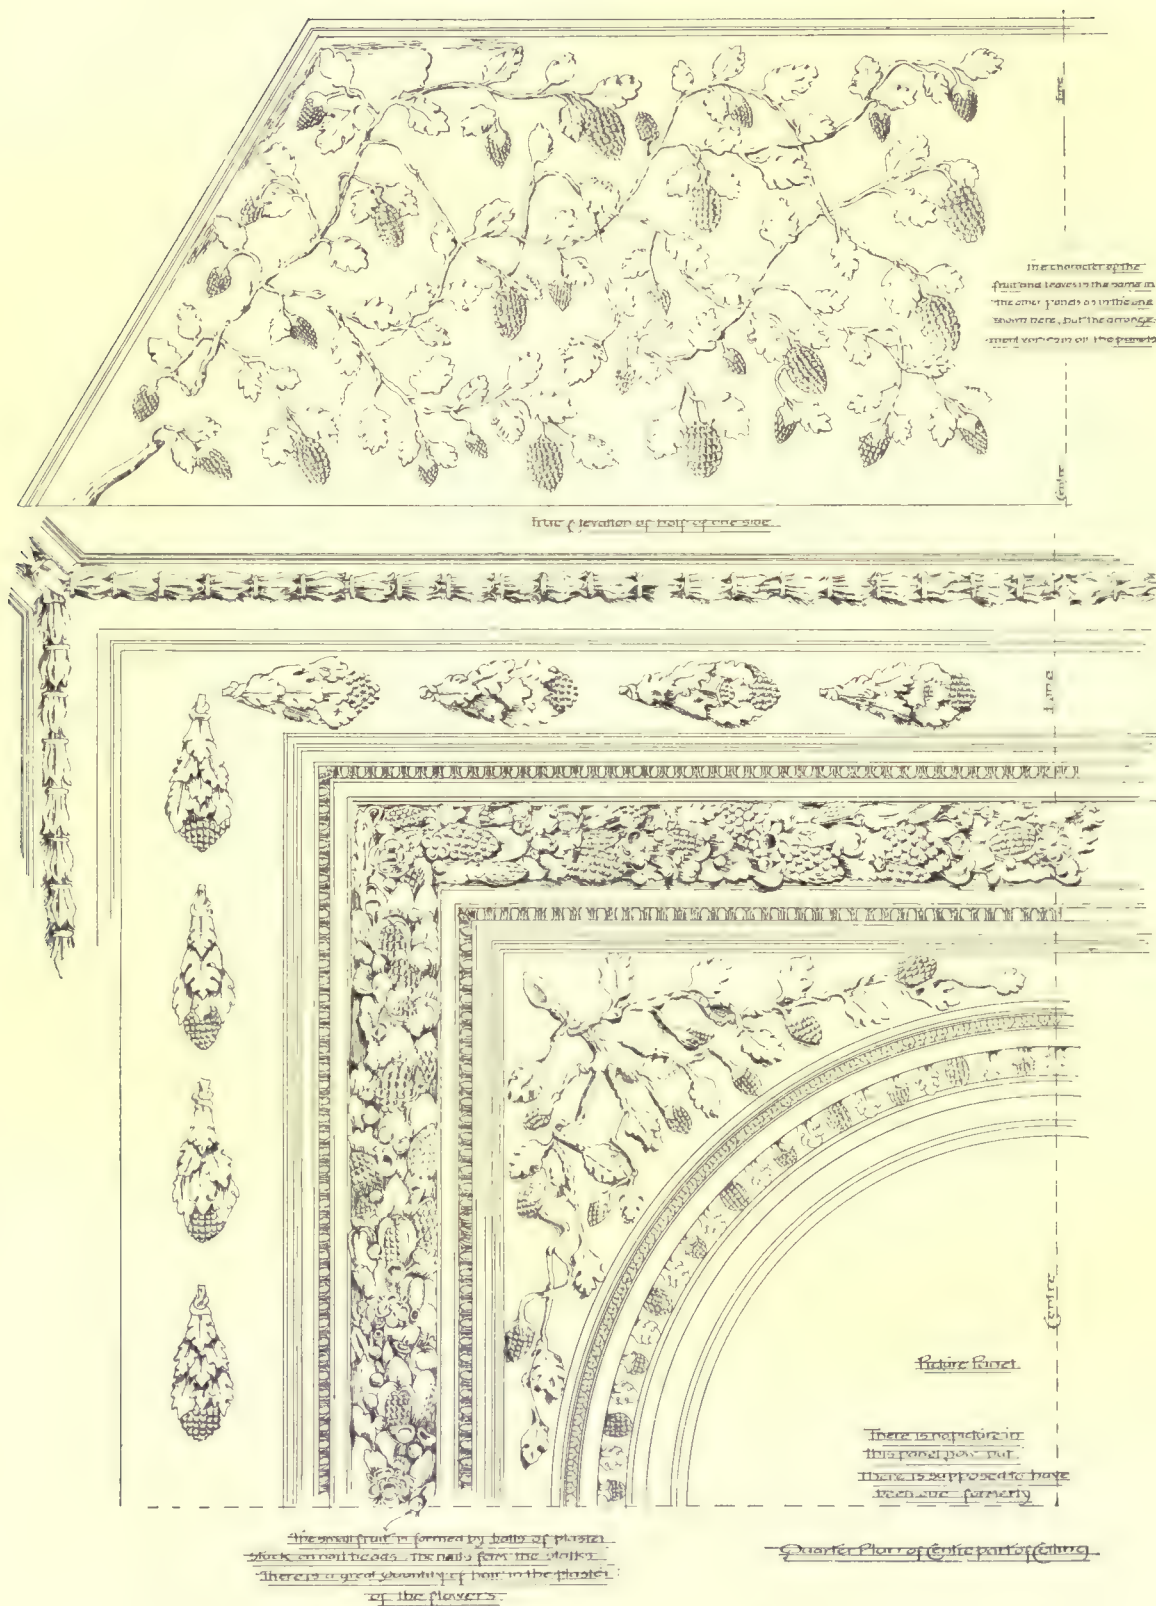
Ceiling of Vine Room, Kellie Castle.
